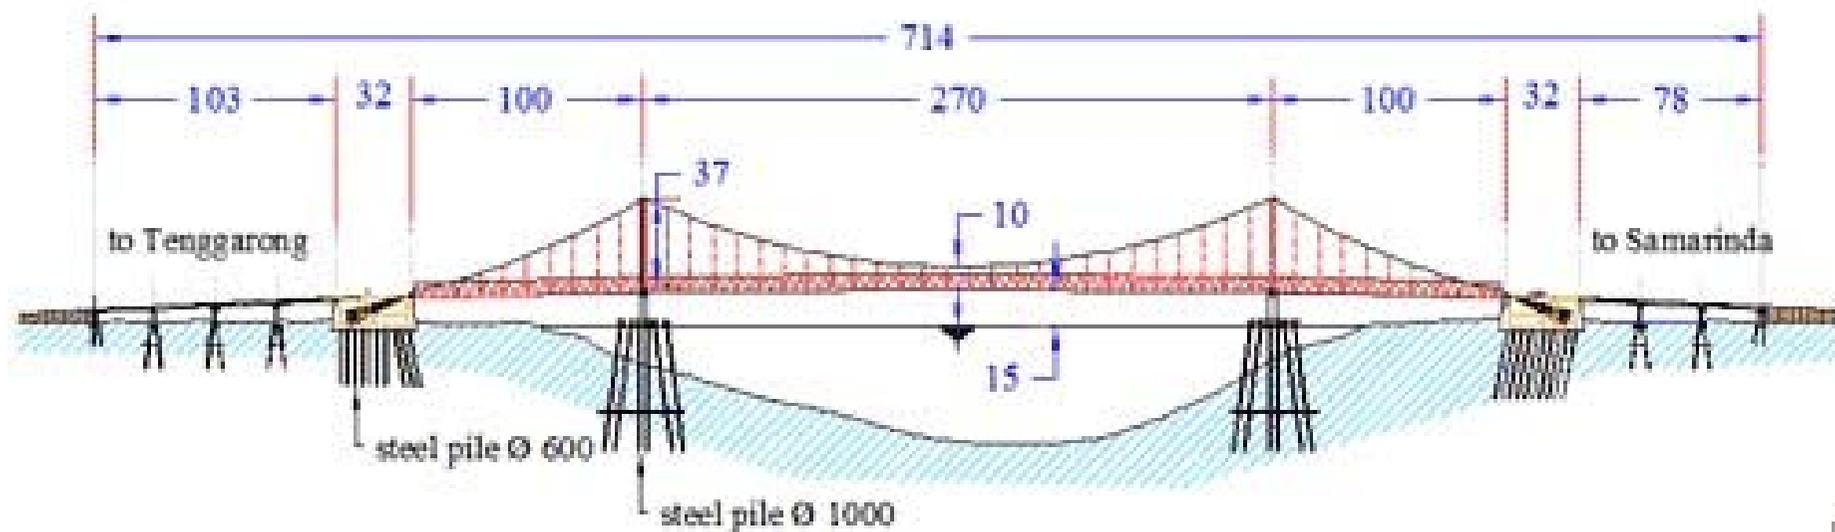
Elevation of The Kartanegara bridge, East Kalimantan (2001)
